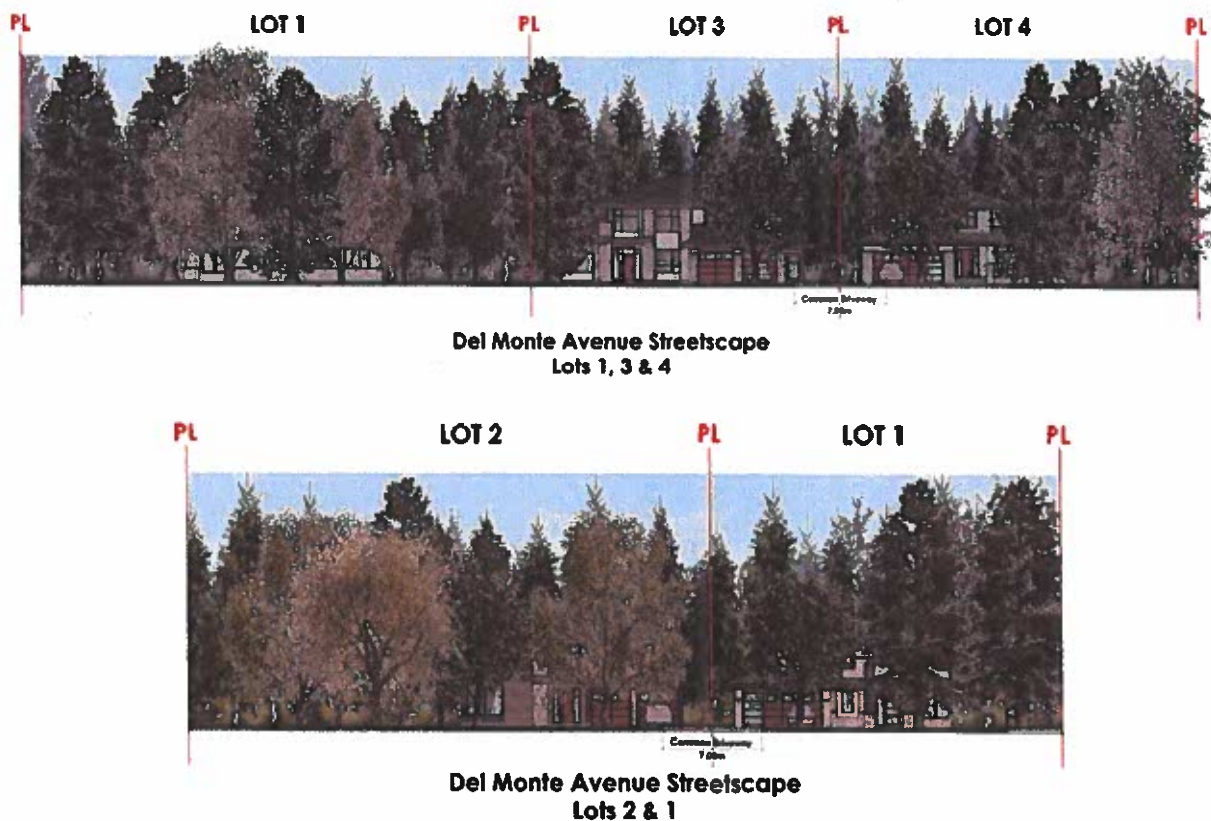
Proposed Streetscape (from plans by Victoria Design Group)
